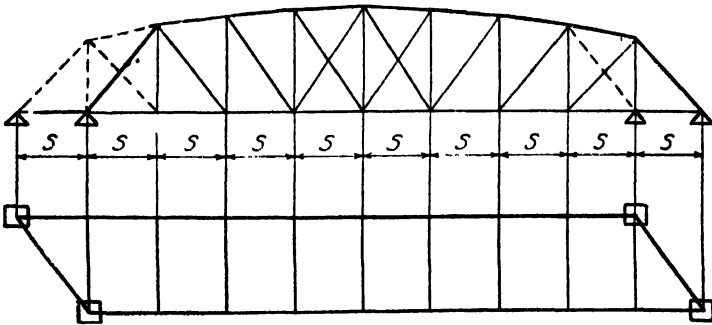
n. Arrangement of Trusses for a Skew Span with Polygonal Top Chords.
